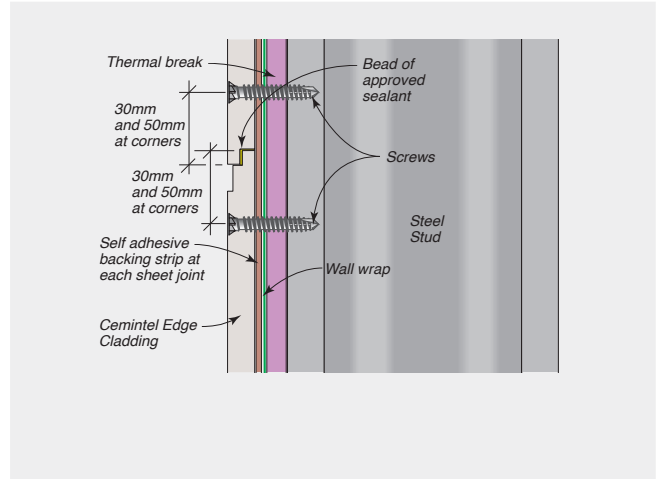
Typical Direct Fix V Groove Cladding to steel stud – Horizontal Joint
